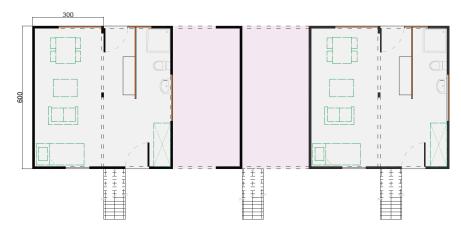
Core houses of the ground floor level dwellings in Quinta Monroy ("Quinta Monroy / ELEMENTAL" 2008)
